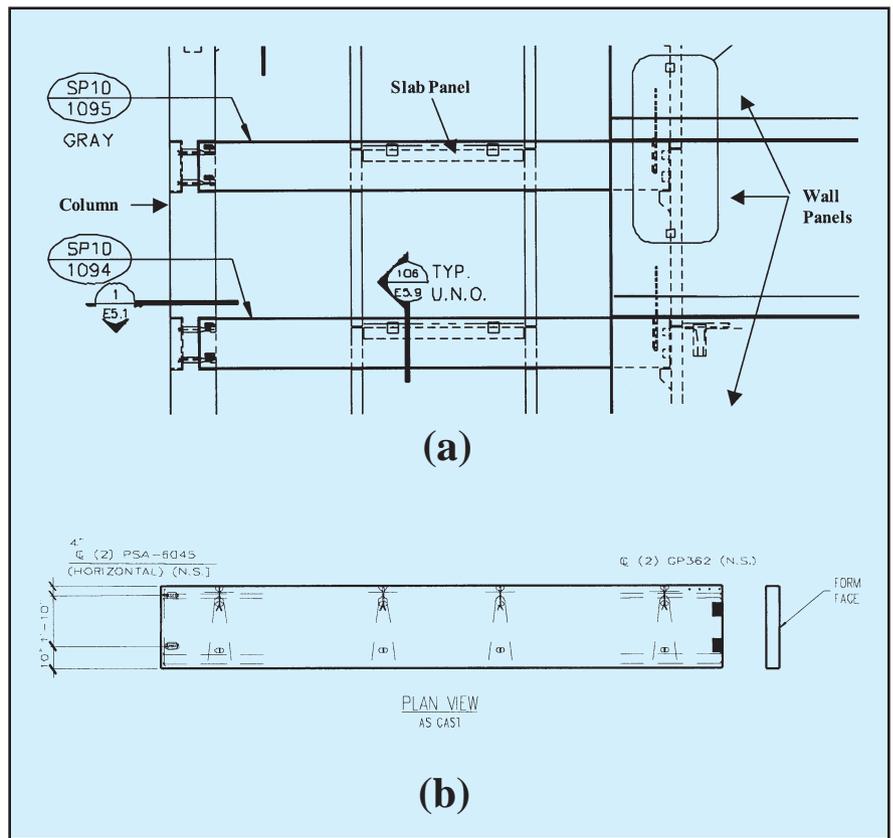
Spandrels in Project F: (a) Elevation; (b) Piece detail.
